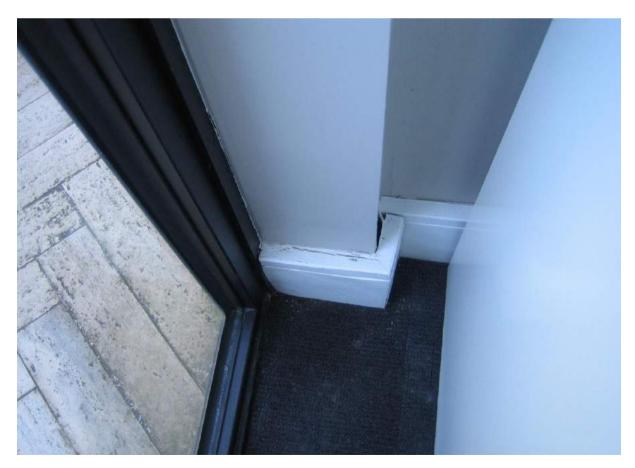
Water damage to skirting at western end of balcony door to Bed 3 to Unit 410.
